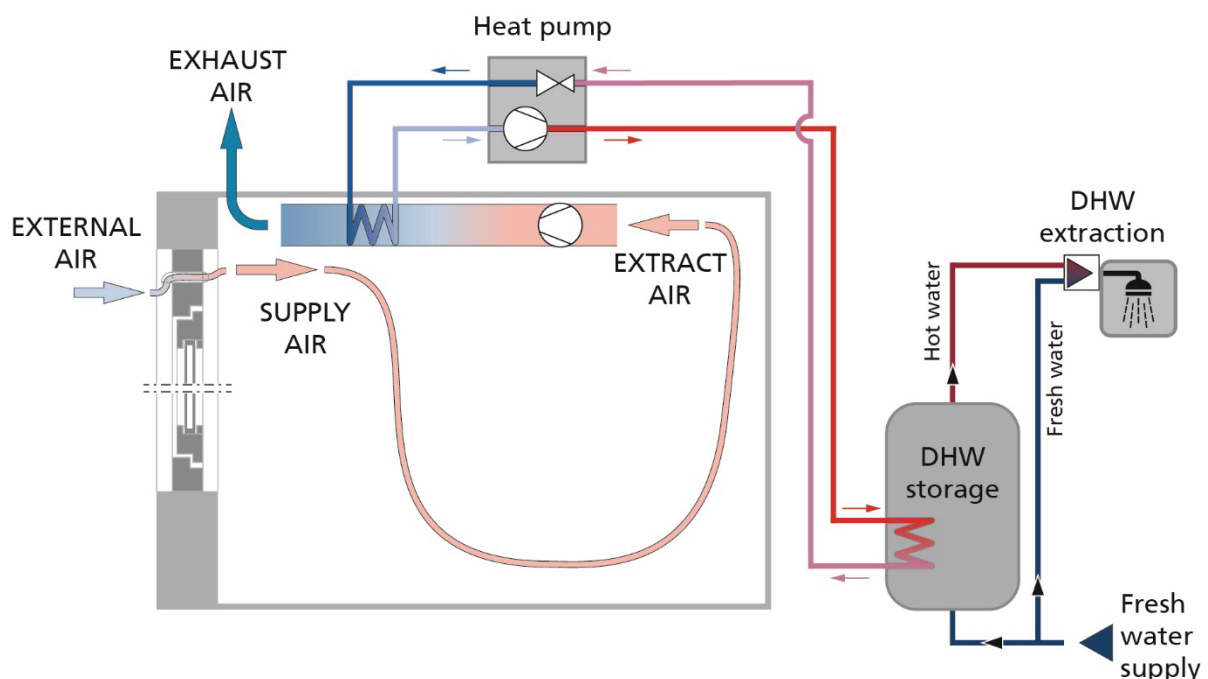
Exhaust air heat pump connected to the domestic hot water storage.
